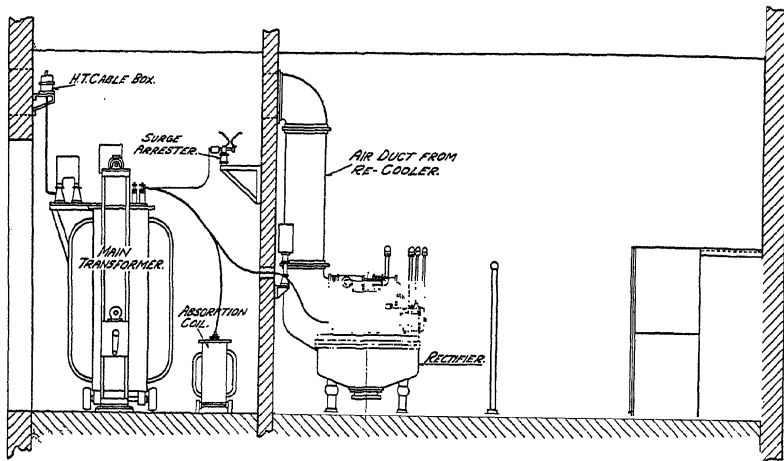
CROSS-SECTIONAL ELEVATION OF RECTIFIER
